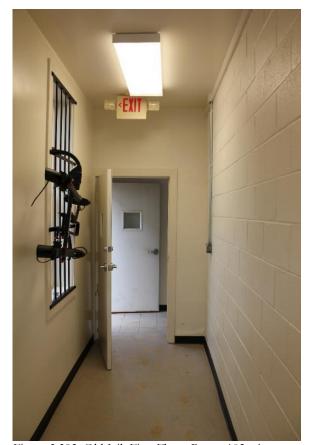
, Old Jail, First Floor, Room 102, view looking north at the west hall.
